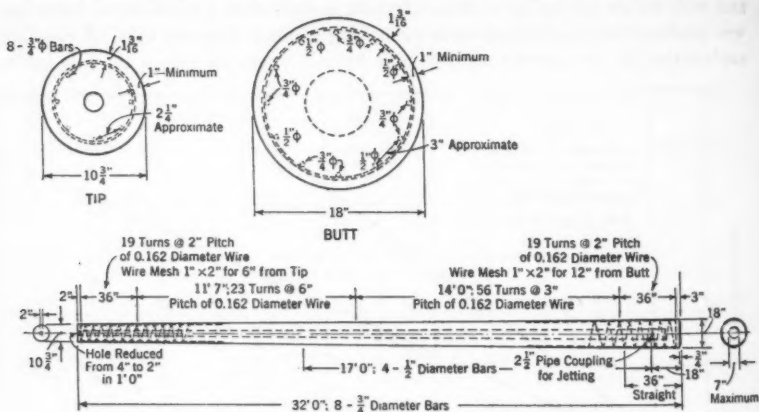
DETAILS OF CONCRETE TEST PILE.
